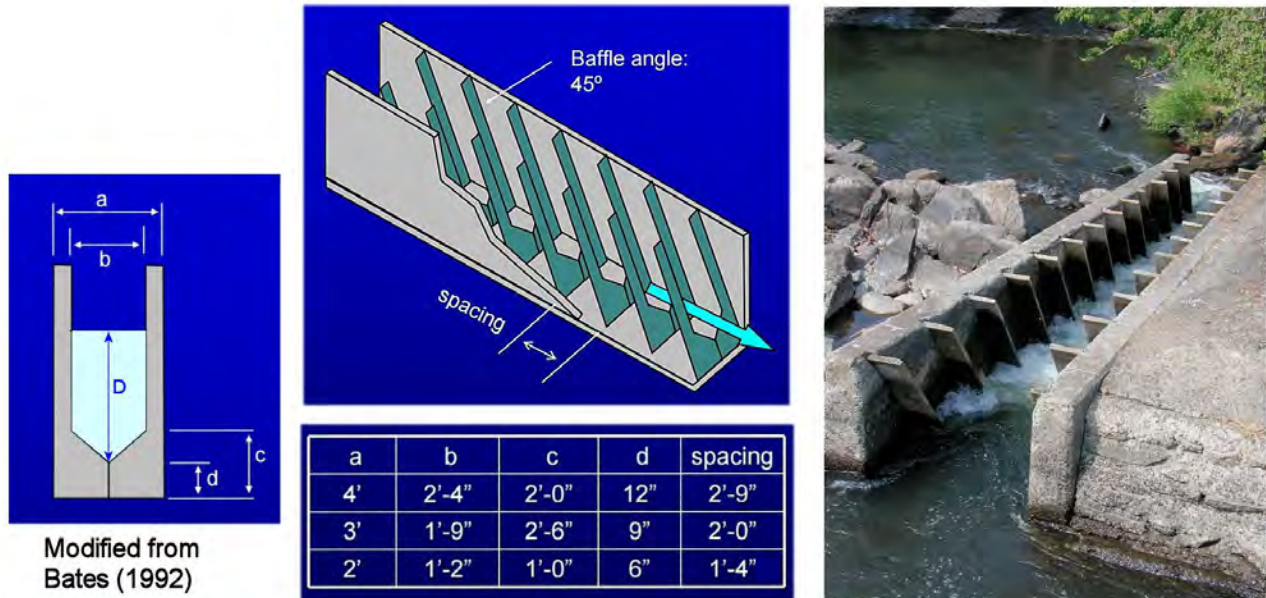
Drawings, dimensions, and a photo of a Denil fishway
